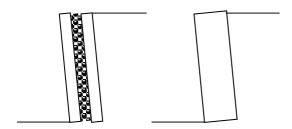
Poor bonding between the front and back face of the wall allows them to act independently, reducing the wall stability (left). Good bonding allows a wall to behave monolithically and better resist overturning forces (right).
